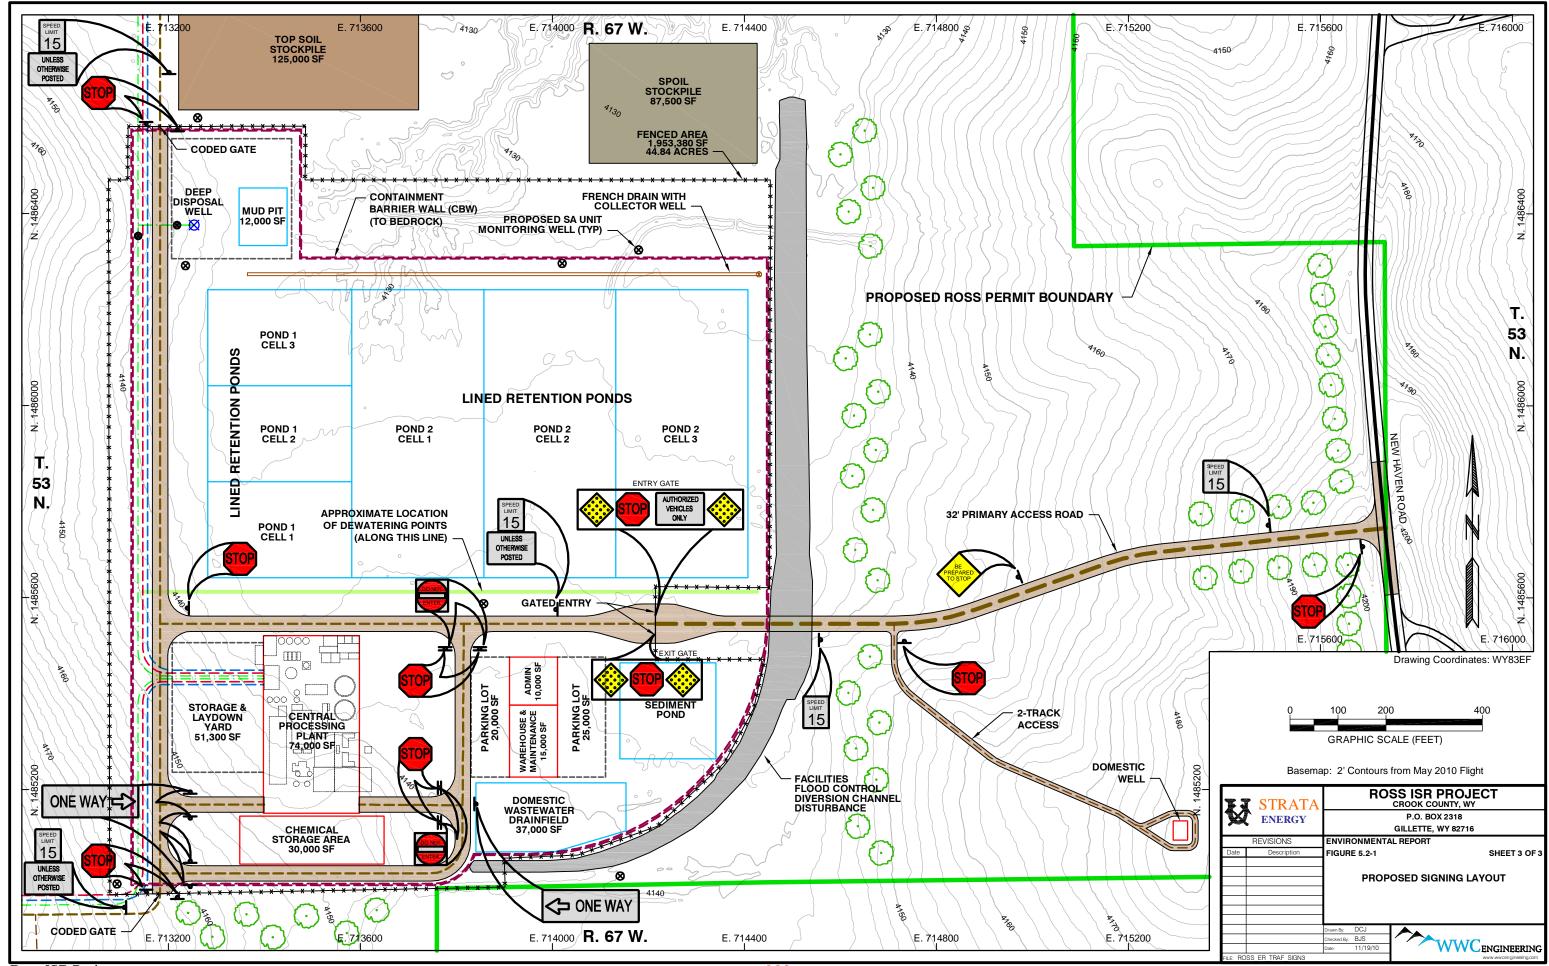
Proposed Signing Layout (Sheet 2 of 3)
